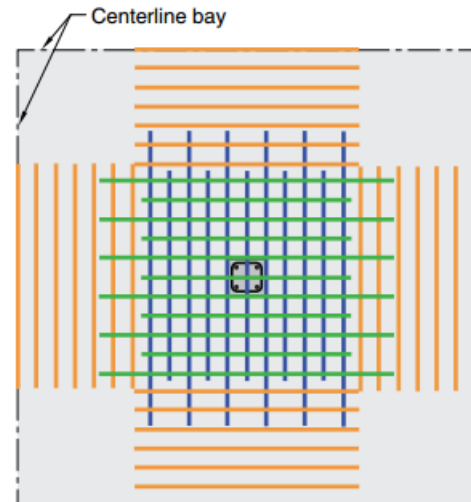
Arrangement of minimum reinforcement near the top of a two-way slab.
